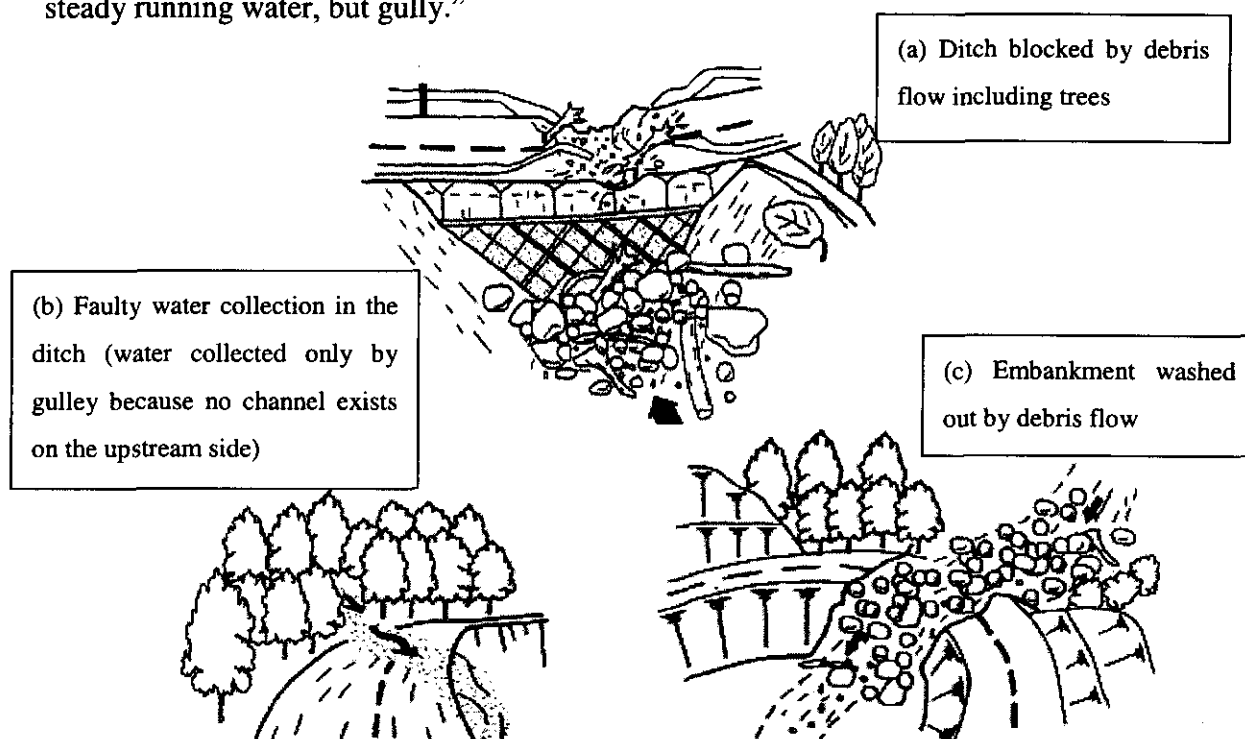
Typical disasters of the face of embankment slope at the crossing point of mountain river
